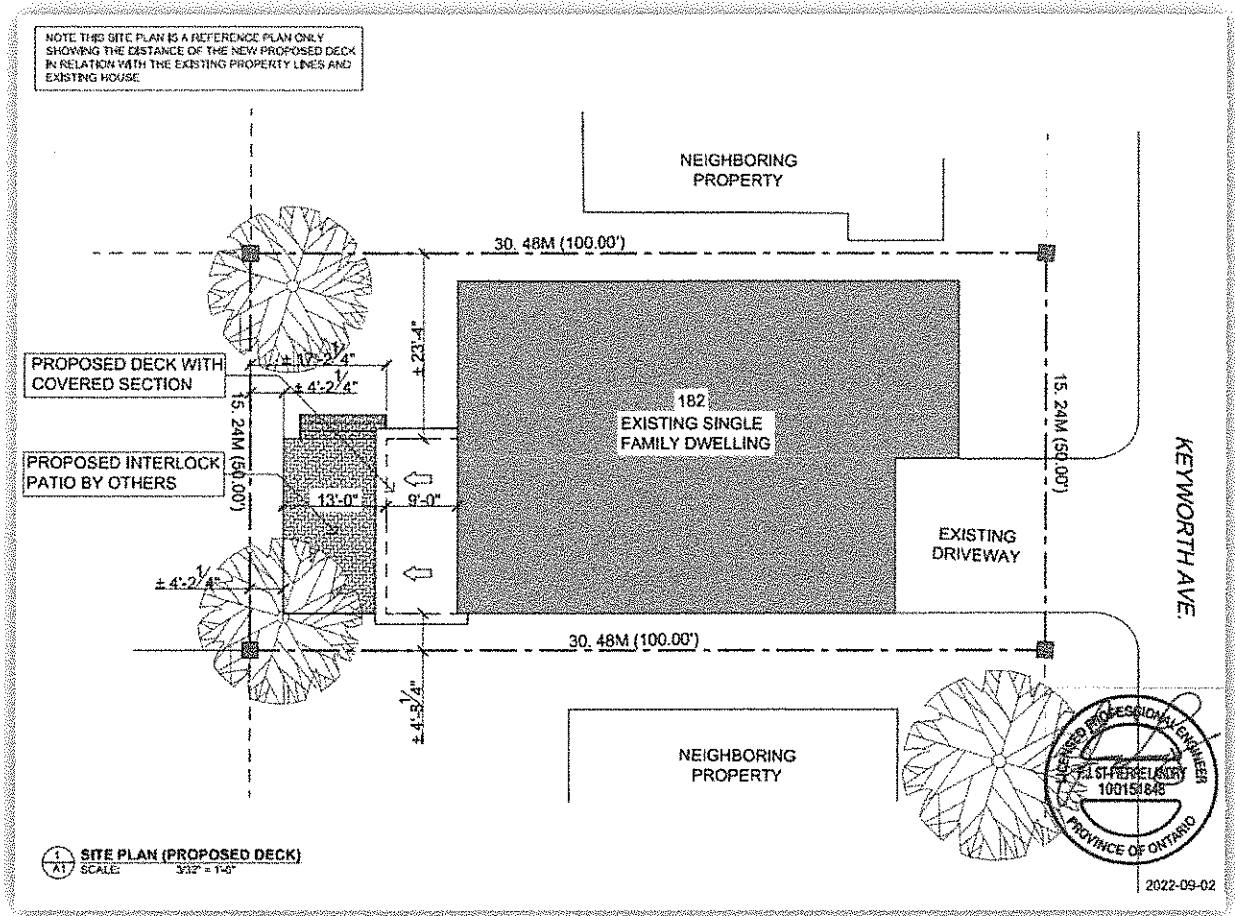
Proposed site Plan to show new deck complete with a roof covered section.
